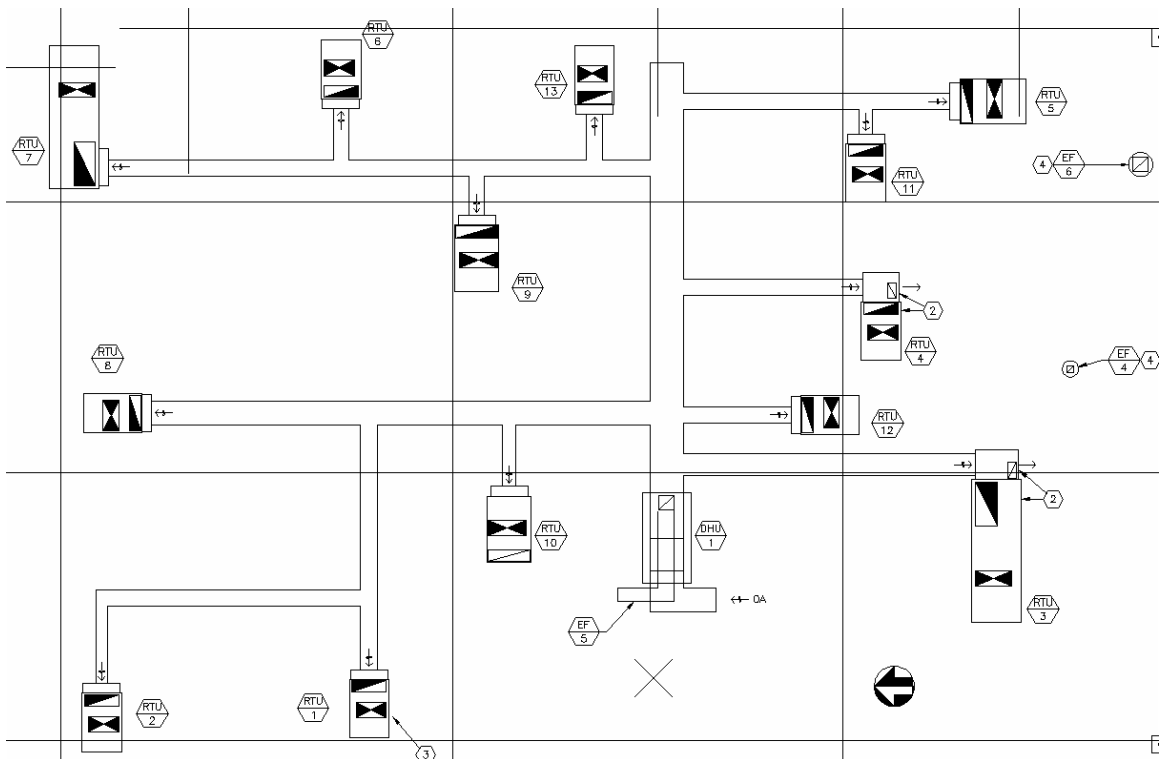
Roof Plan Including Desiccant Dehumidification Unit
